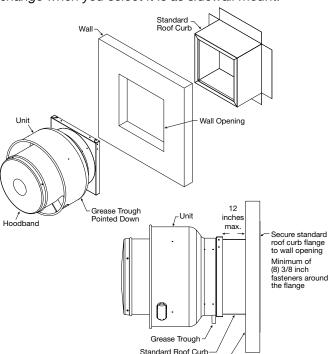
Typical Sidewall Mounting Installation (Through Wall)
